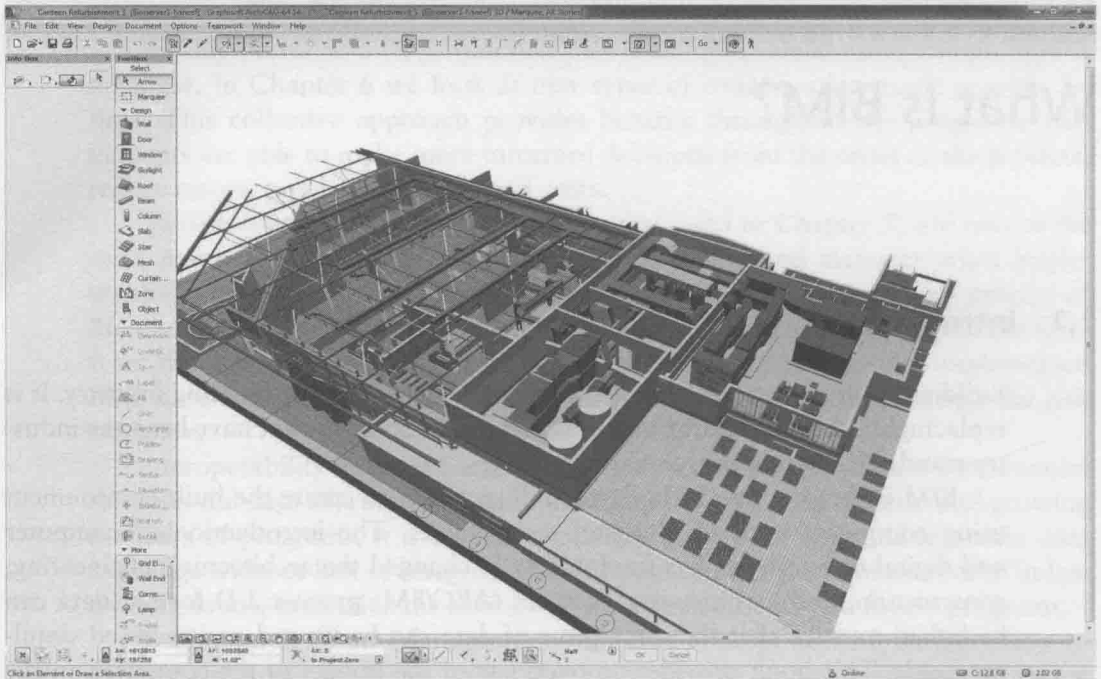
Virtual building. Aziz Tayob Architect's Canteen project includes the HVAC system, the structural system, and building design models (see also Chapter 10).
